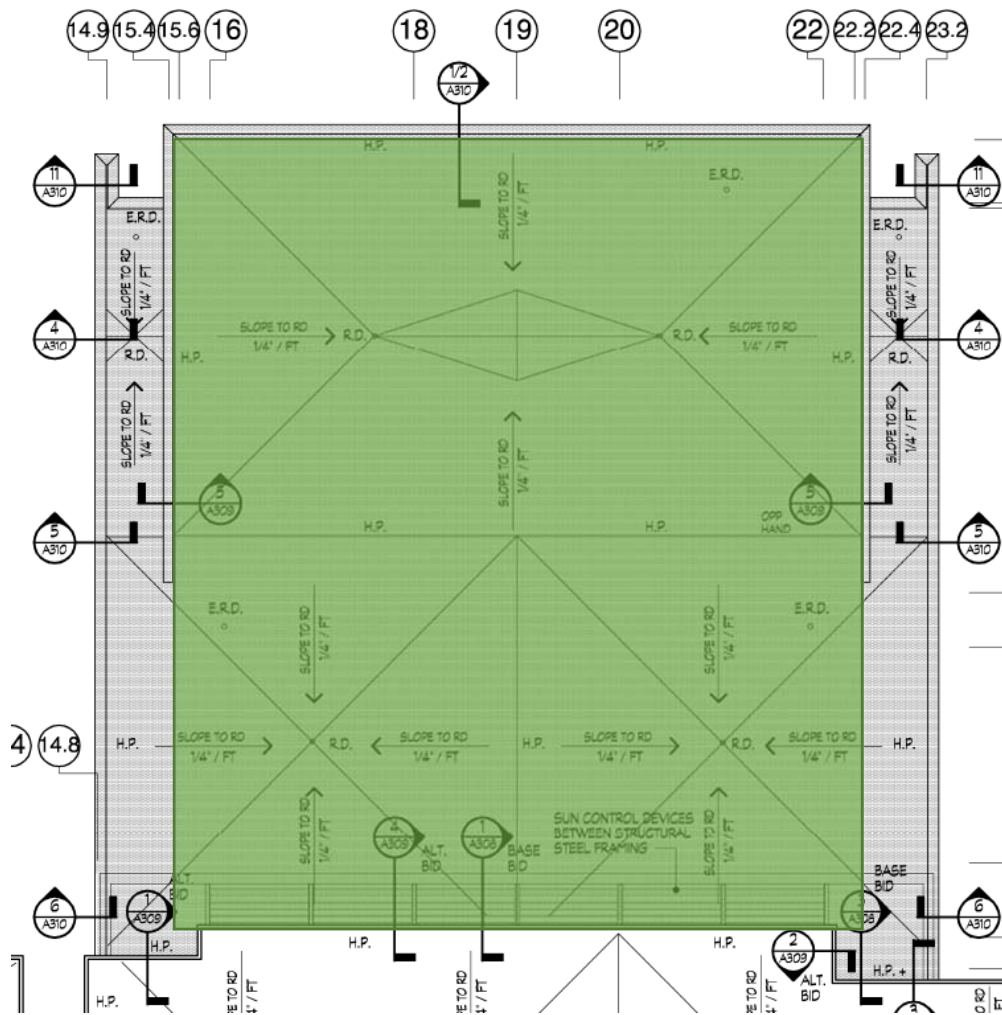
Proposed Green Roof Location and Size (5585 sq. ft.)
